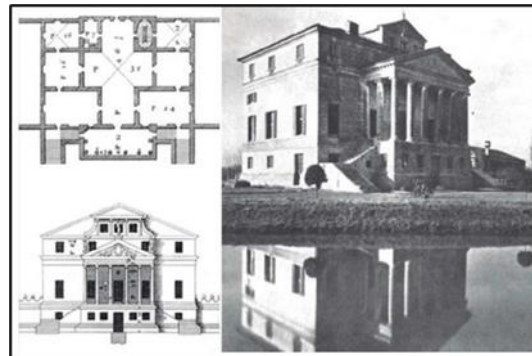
Visuals of Villa Foscari's facade views and floor plan [7]
